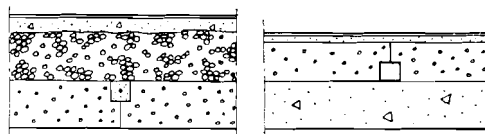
Roof sections of light-weight concrete with small ducts in the elements or otherwise ventilated, and concrete slab with light-weight concrete insulation with ducts or grooves for ventilation.
